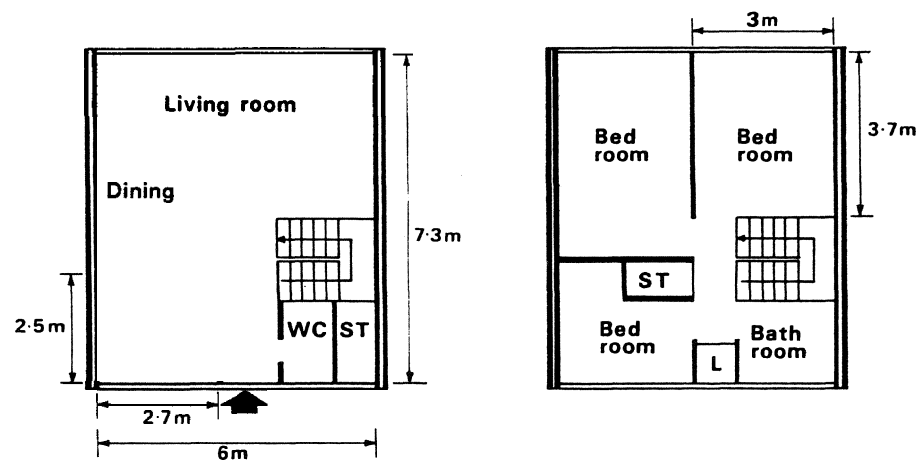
Plan of centre terraced house floor area - 90 m<sup>2</sup>
